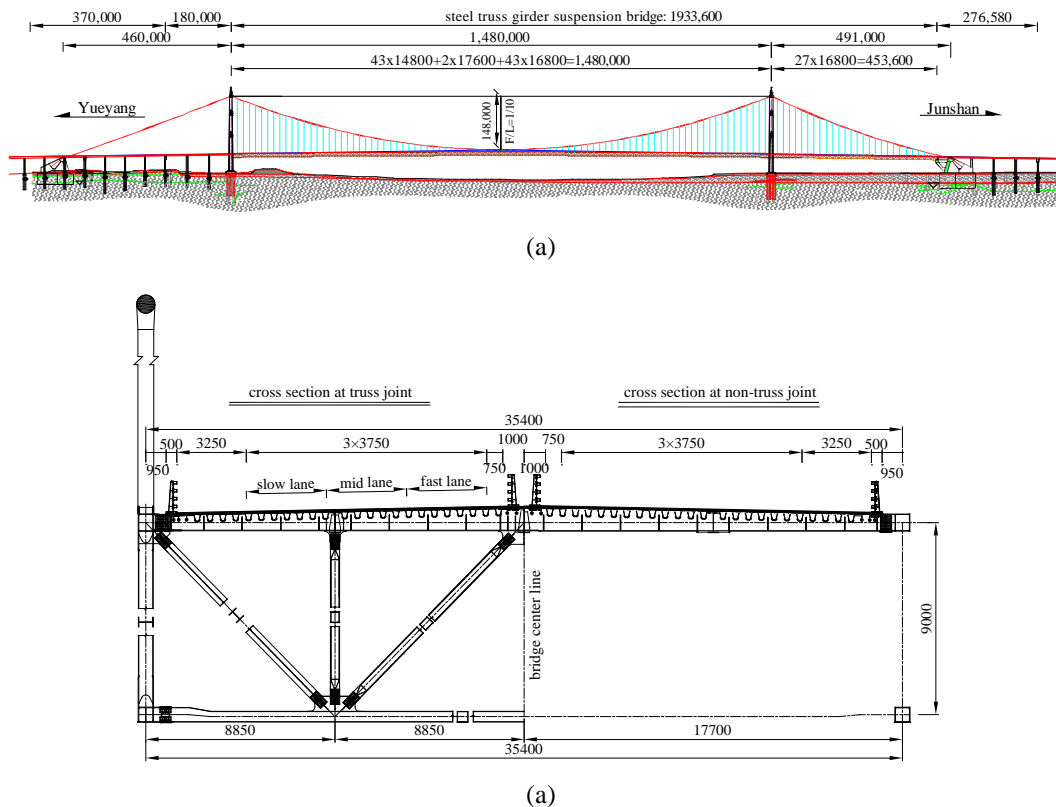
The SDTL Bridge (all dimensions are in millimeters): (a) elevation view; (b) cross section of the steel truss girder.
